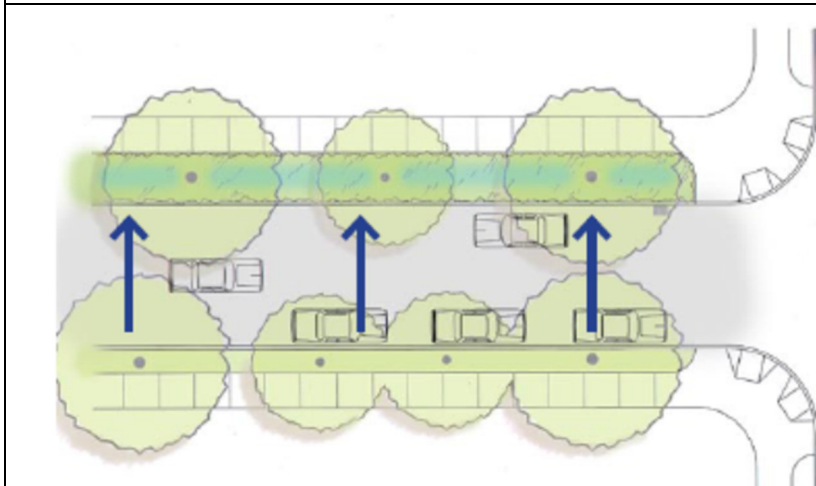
Side Shed Street Profile. Side shed streets are designed to shed all water to one side of the street. GI facilities would be located on the downslope side.
